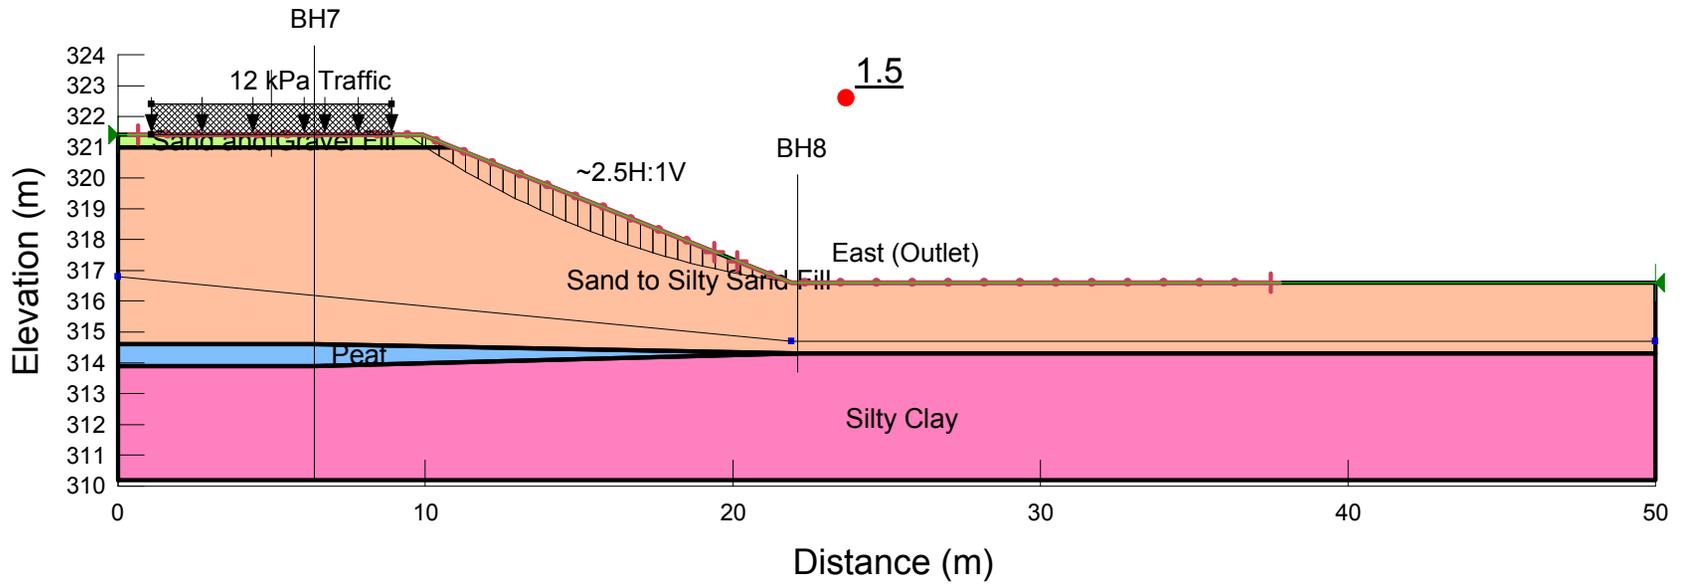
Slope stability analysis for existing embankment at storm water outlet – undrained static conditions
